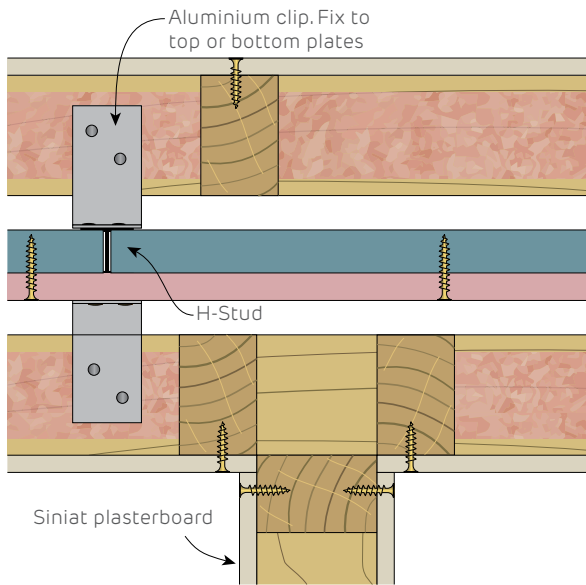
Interhome Wall with Non-Fire Rated Intersecting Wall
